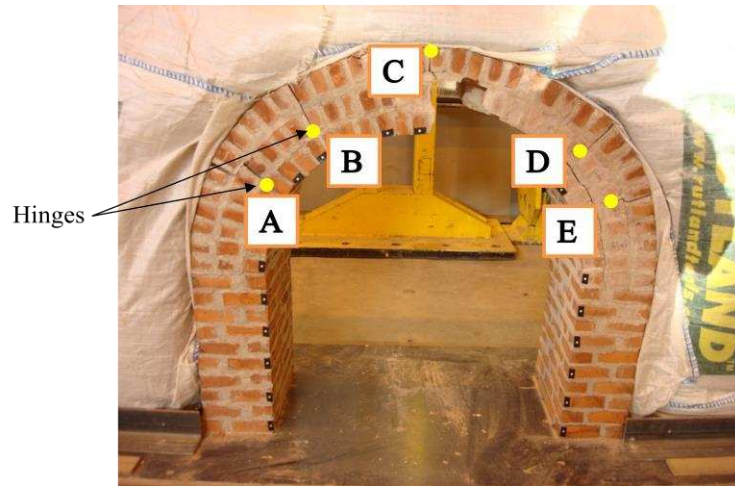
Structural hinges with cracking of the tunnel arch under concentrated load
